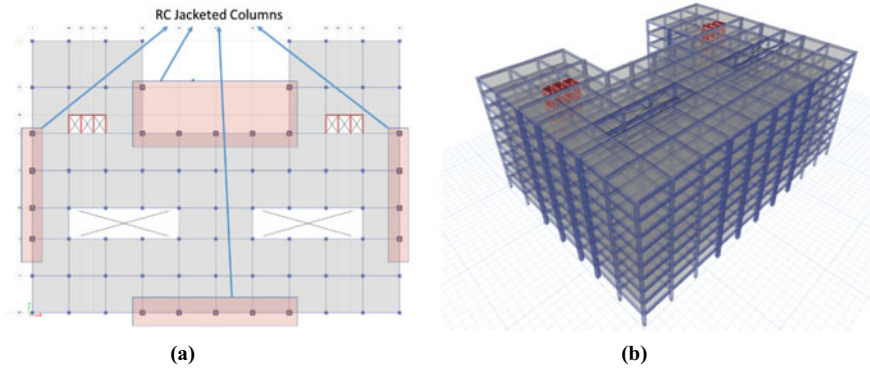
Hospital building retrofitted locally with reinforced concrete jacketing introduced into the hospital building on distressed structural members due to earthquake loading: a plan and b isometric view
